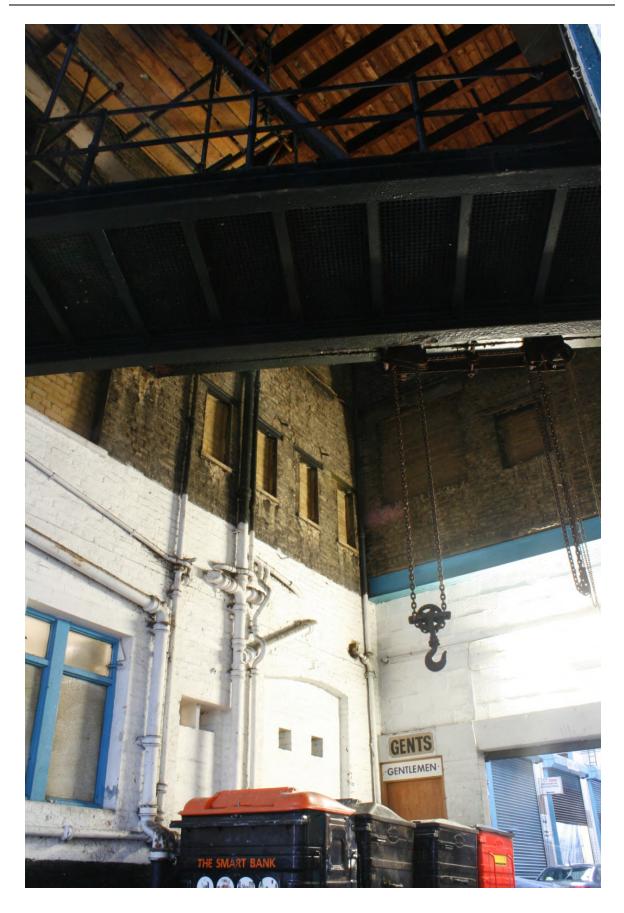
Overhead bridge within passageway, looking north (72FmLa D100 051)
